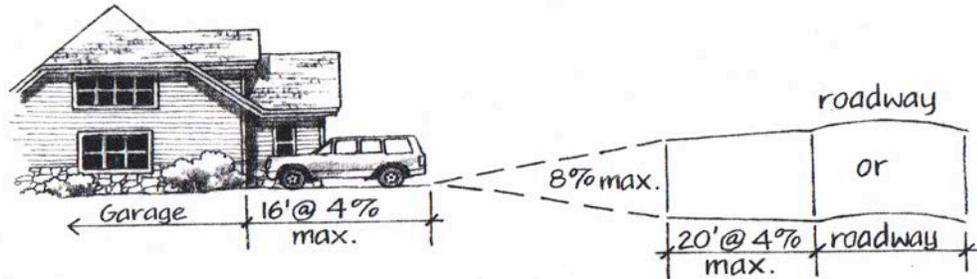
ILLUSTRATION OF DRIVEWAY SLOPE
